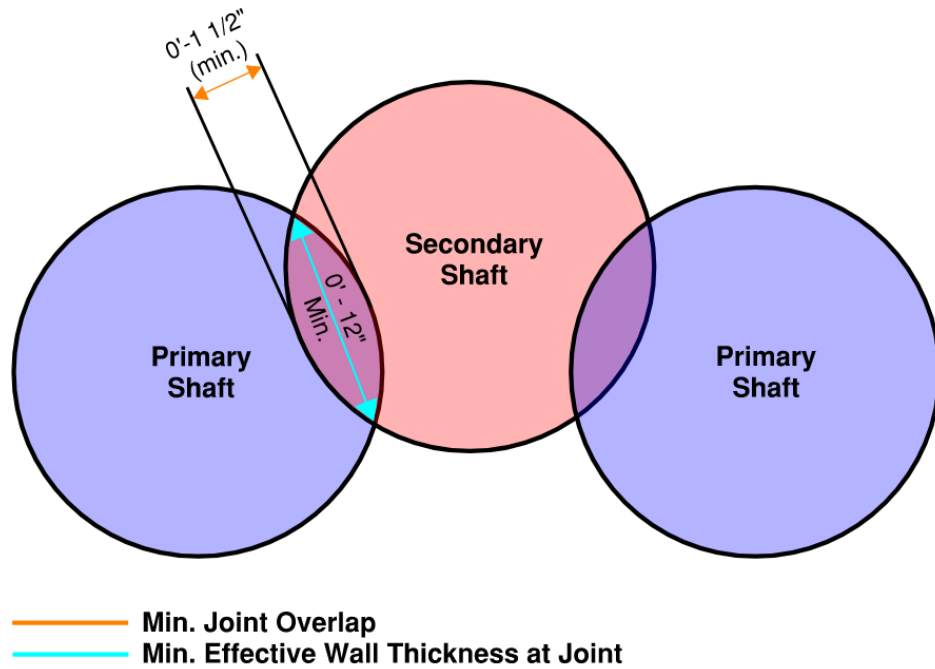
Figure A: Minimum Joint Overlap and Effective Wall Thickness for Out-of-Plumb Shafts
